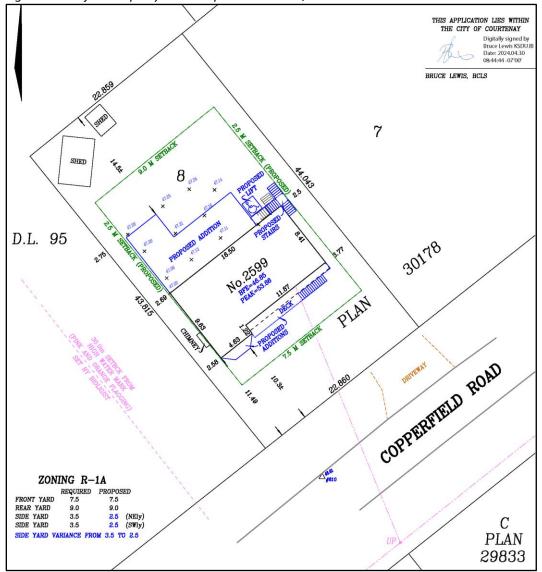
Subject Property with Proposed Addition, External Stairs & Setbacks
